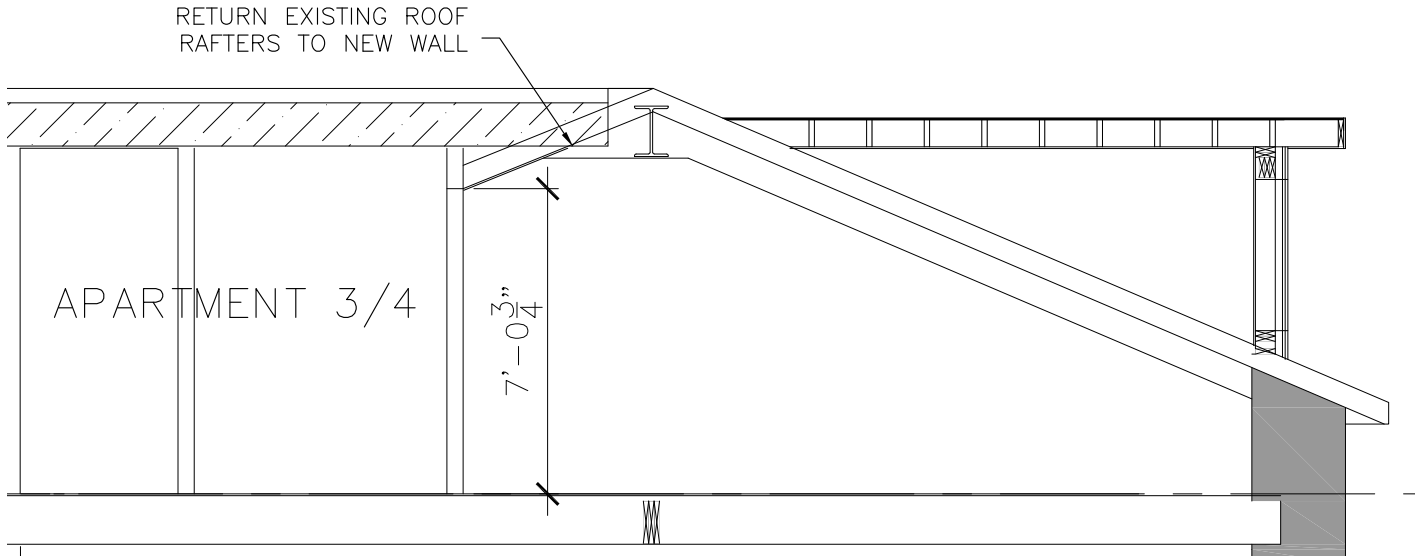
Drawing showing new roof attaching to existing roof, and the required minimum head room on the third floor.
